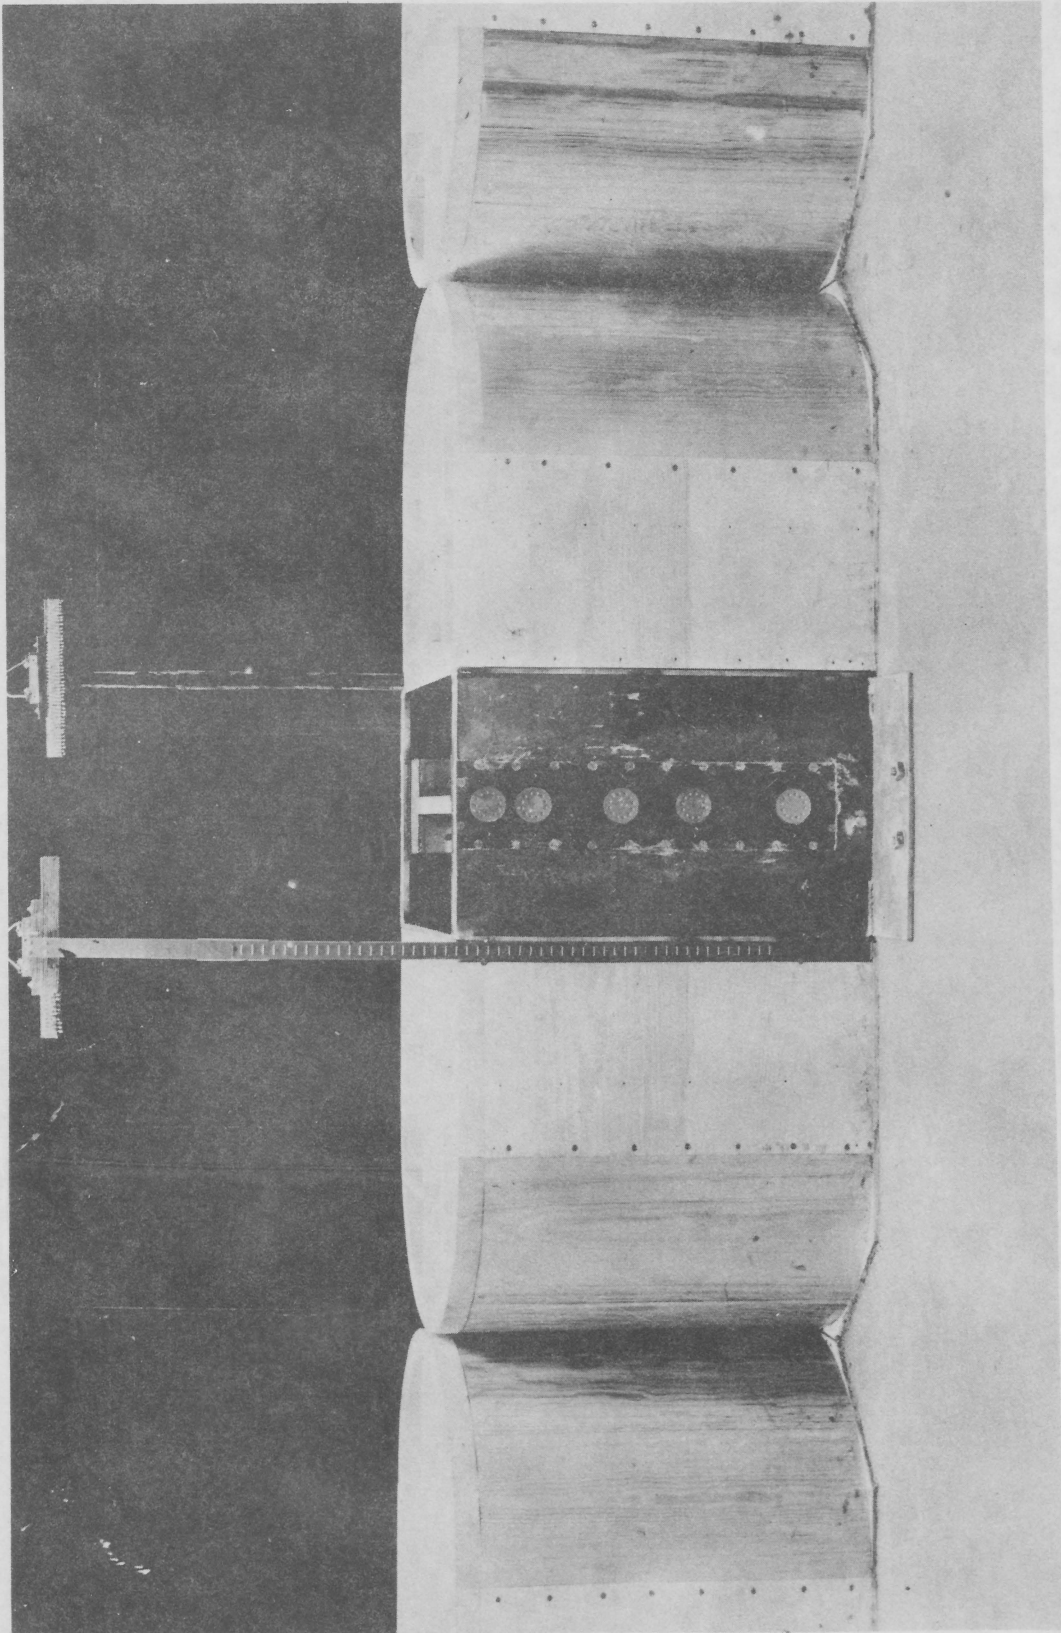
Vertical-wall breakwater section constructed of wood; pressure-cell section constructed of steel (Hudson, 1945).
